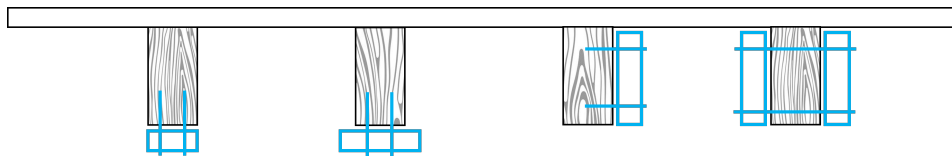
Examples of reinforcement techniques of timber floor beams with additional timber elements
